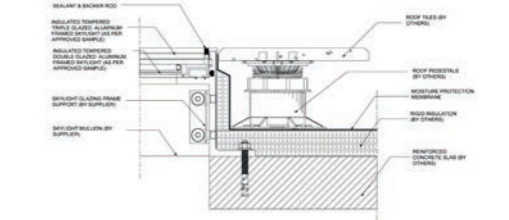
Walkable skylight detail of the linking bridge between the original and the extension buildings by R. Abouseoud
